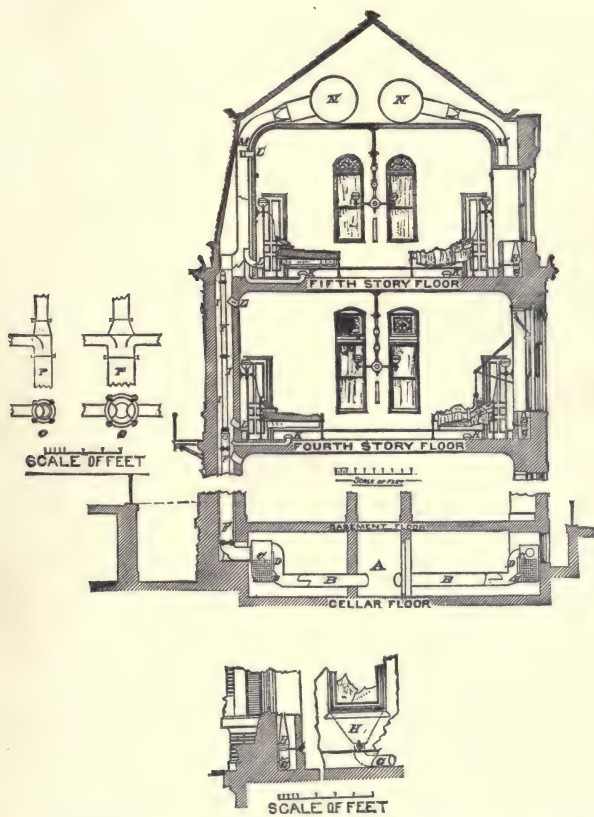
NEW YORK HOSPITAL BUILDINGS.—DIAGRAM OF VENTILATION AND HEATING.
